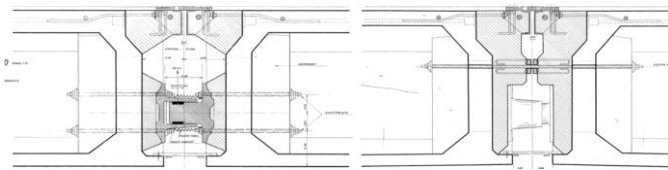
Longitudinal cross section of the Zeeland bridge sliding (left) and fixed (right) mid span joints.
